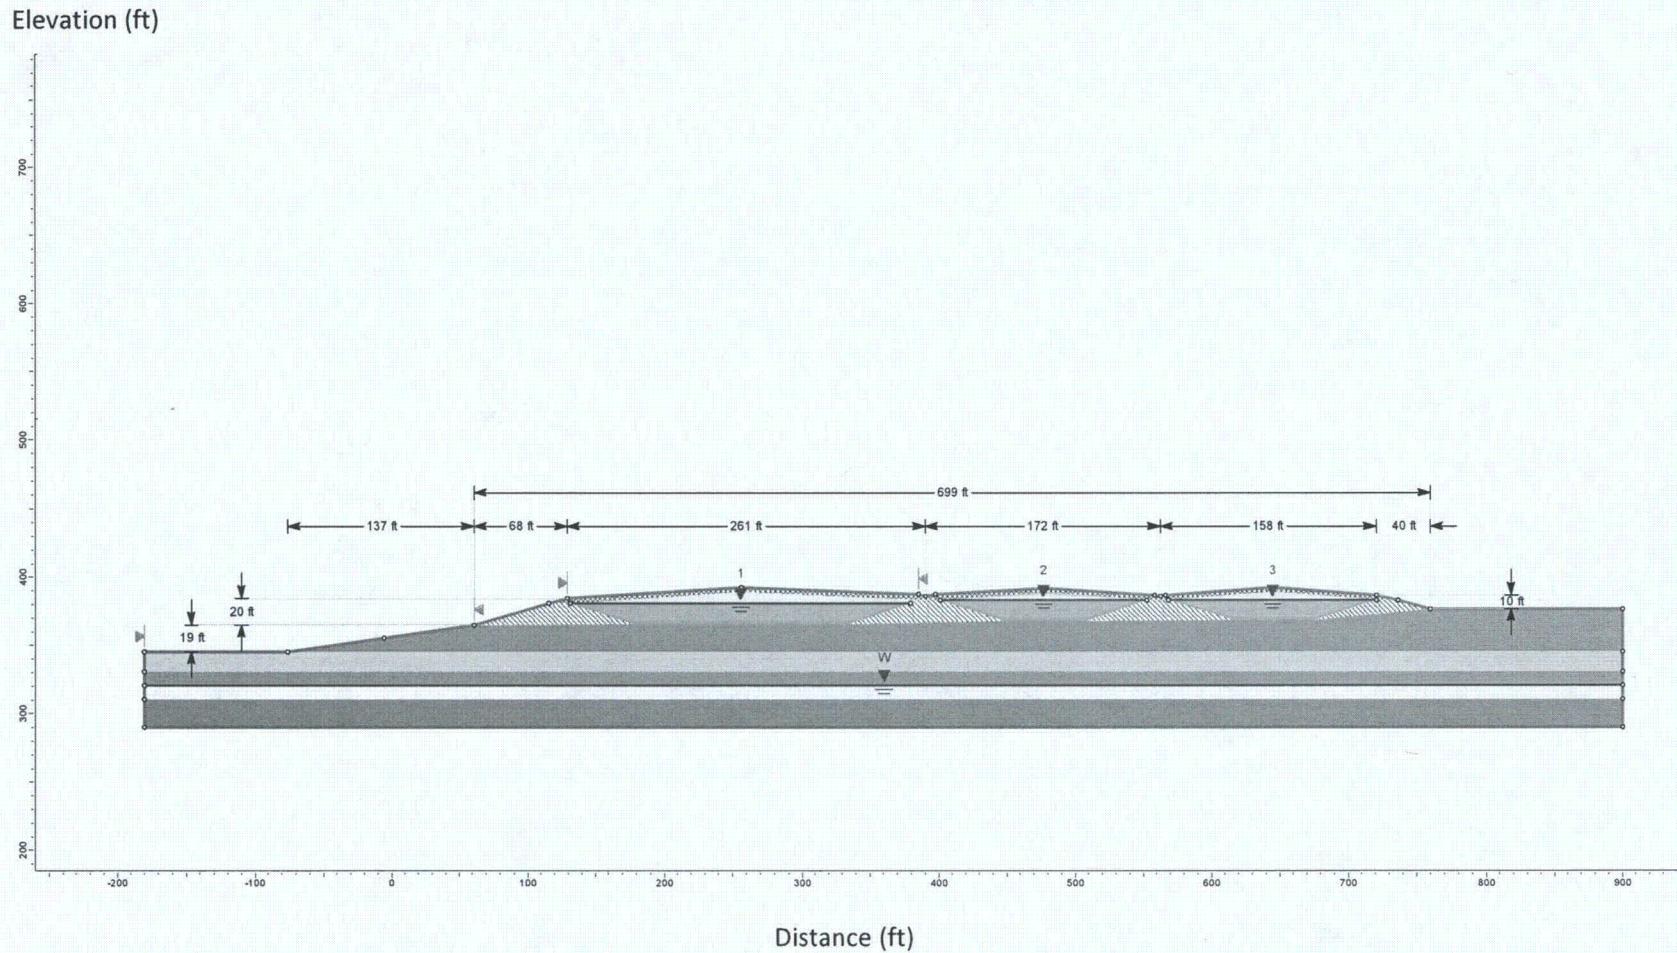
Cross section A-A showing subsurface and groundwater conditions.
